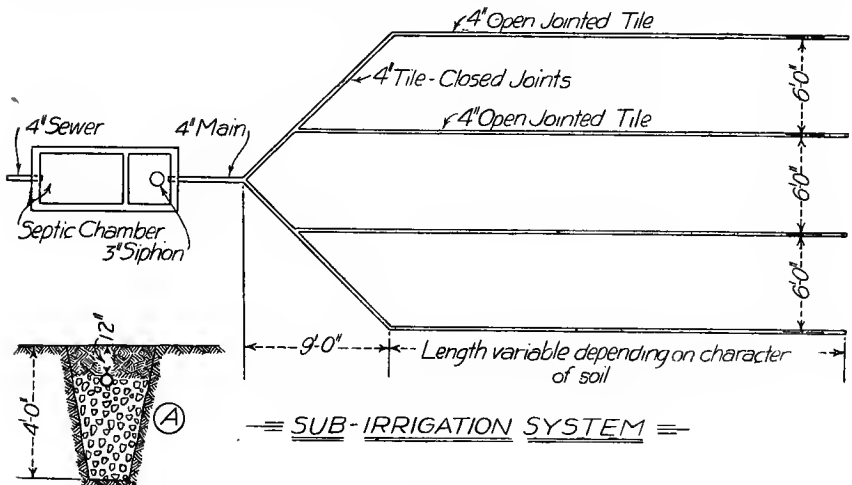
Plan of Septic Tank with Final Disposal System After the Sub-irrigation Method, showing also a section of trench which may sometimes be necessary when tile are laid in tight soil
